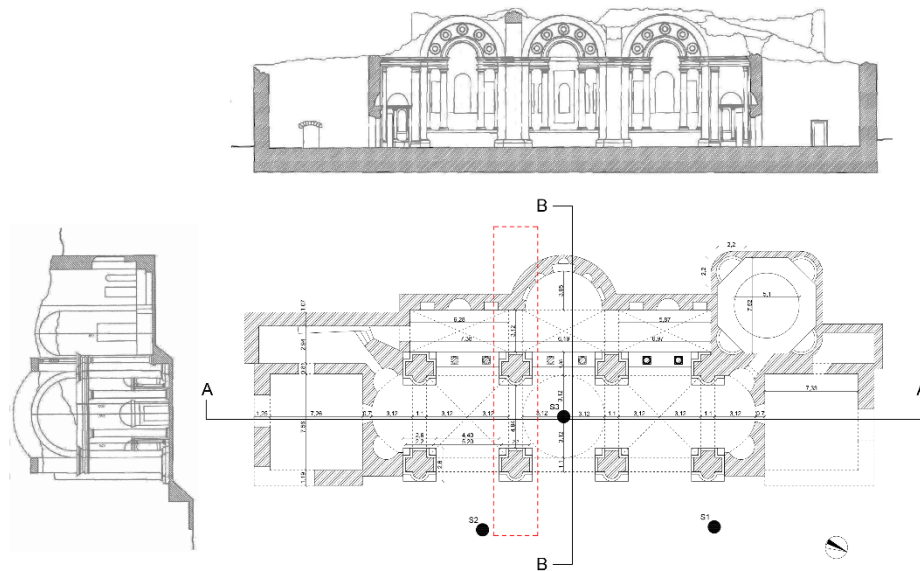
Plan, longitudinal A-A and transversal B-B sections.
